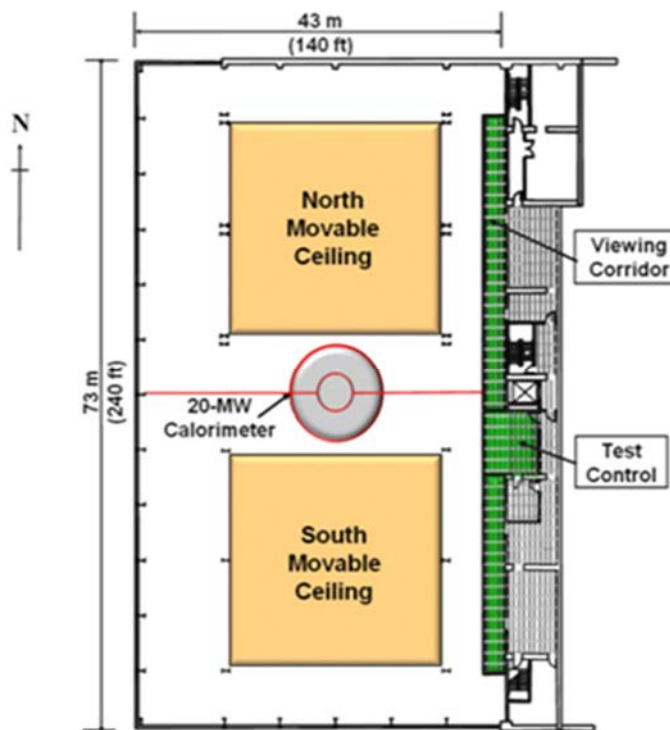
Illustration of FM Global Large Burn Laboratory test locations
